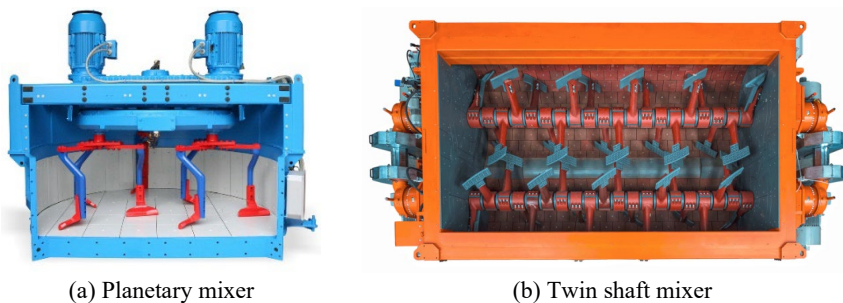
Mixers preferred for mixing fibre reinforced concrete
